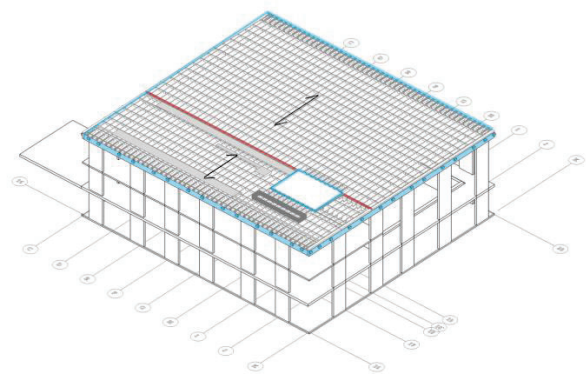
Axonometry of the indoor swimming hall (blue – concrete ring beam and core, red – steel support)
